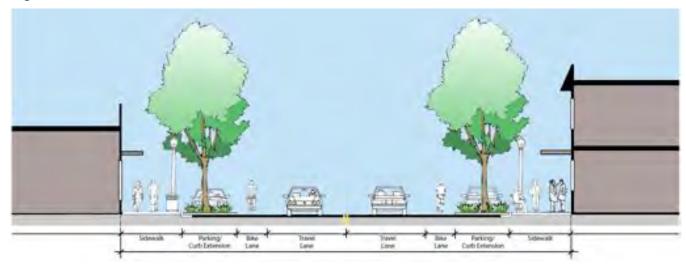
gives a typical downtown street section with curb extensions that "shadow" or match parallel parking width.
